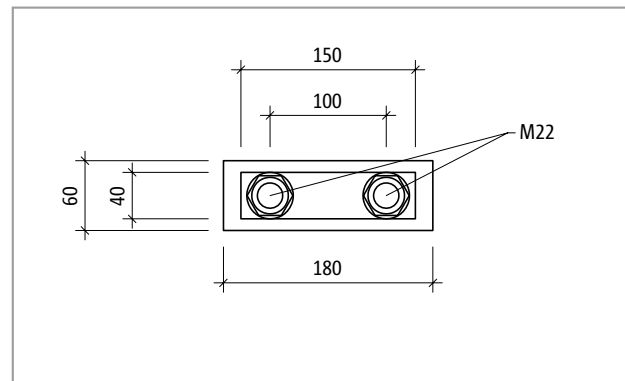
Schöck Isokorb® T type S-N-D22: Elevation of the product
